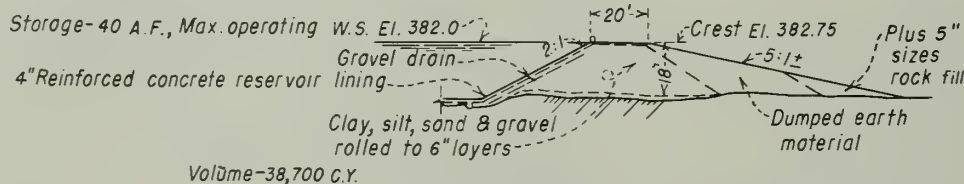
Typical dike section, Big Sandy Dam, located on Big Sandy Creek, Wyo. (Constructed 1950-52.)
